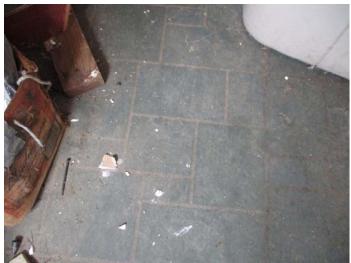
Green square & rectangle pattern vinyl floor & adhesive in the left side front area
